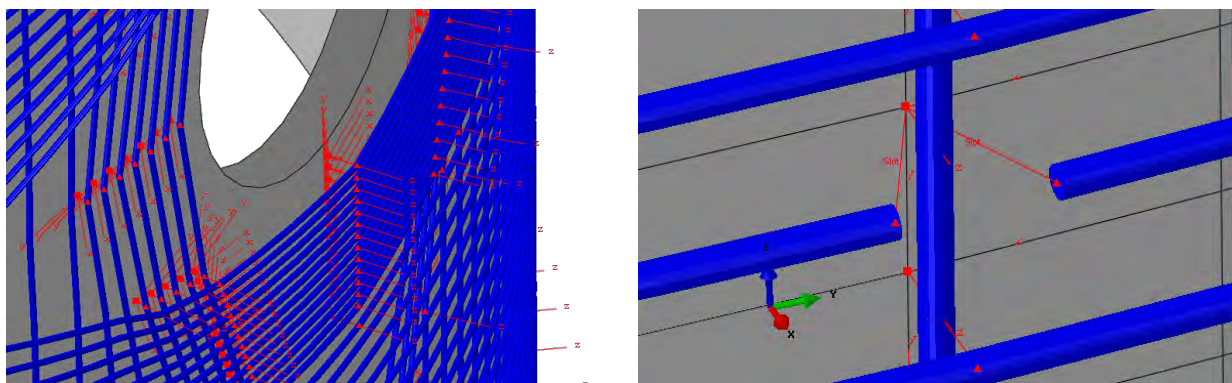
FE model details around E/H (left) and at the anchoring buttress (right) with connectors.
